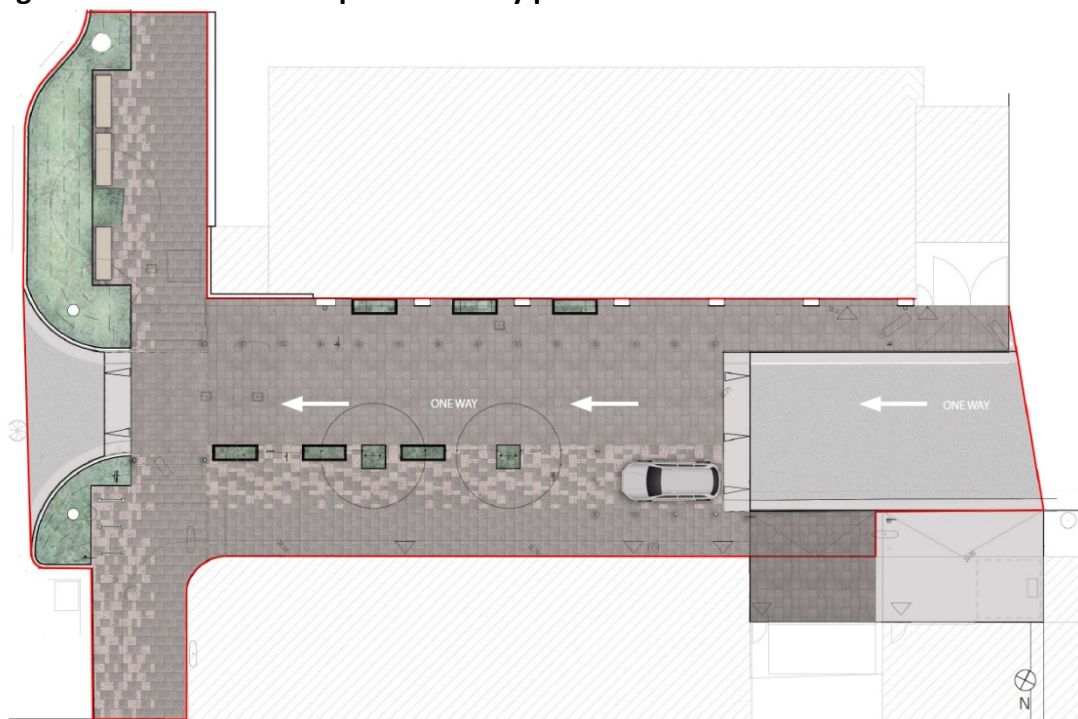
Bligh Street Shared Zone Option 1 – Fully paved shared zone
